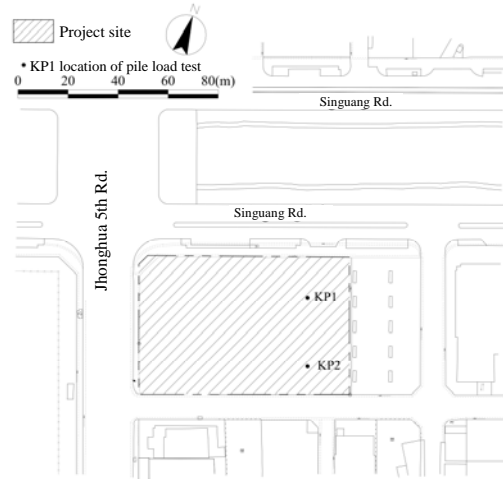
Site plan and locations of test barrette piles (Kaohsiung site)
